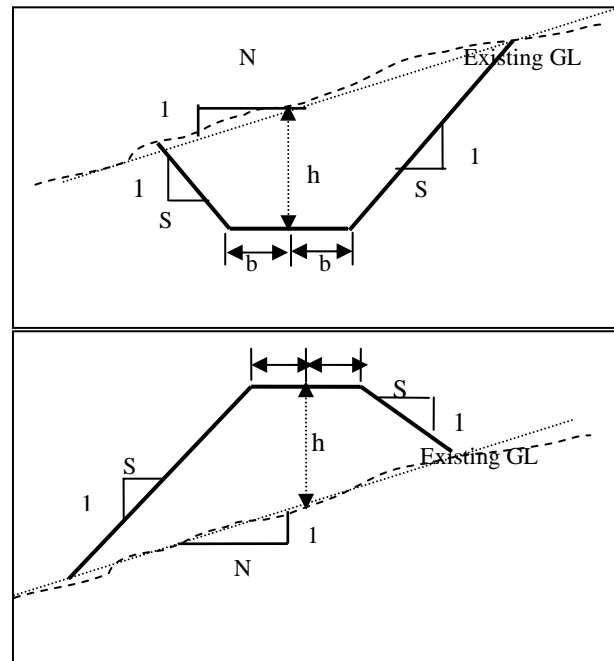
Typical cross-section of road projects having transverse slope of terrain surfaces.
